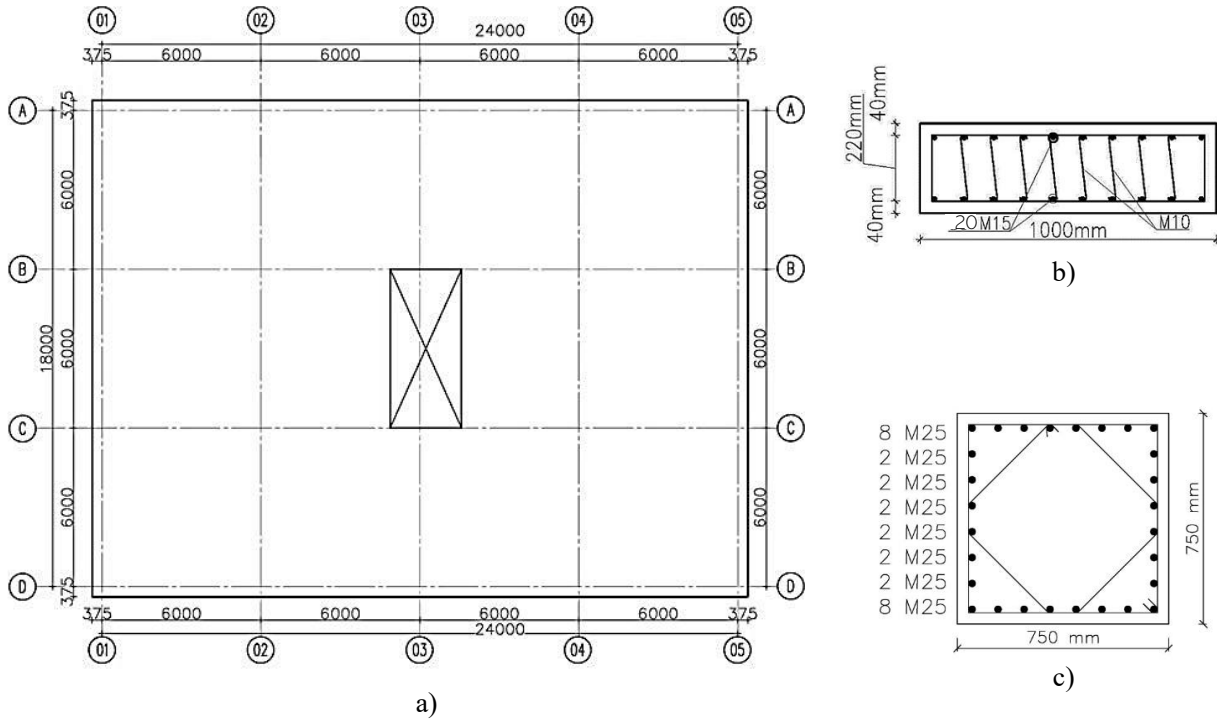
(a) Slab plan layout, (b) shear wall segment and (c) column cross-section
